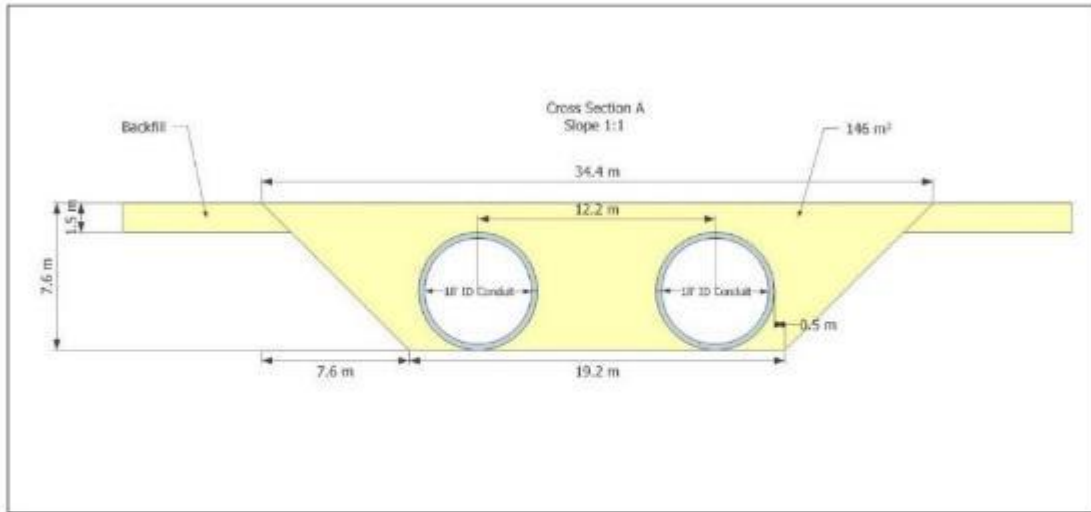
Cross-section A showing trench for removal of 18-ft (6-m) ID intake and discharge conduits with side slope 1:1.
